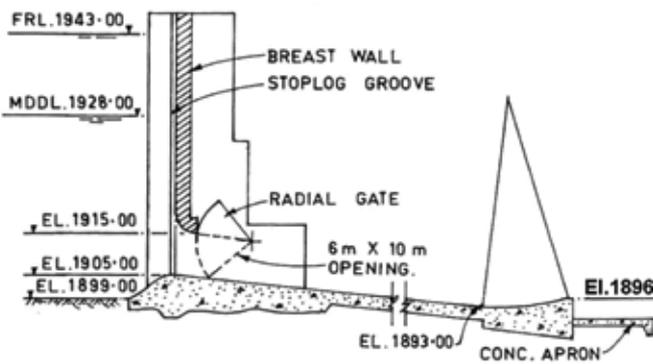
Spillway cross section of Chukha dam spillway^[11]
